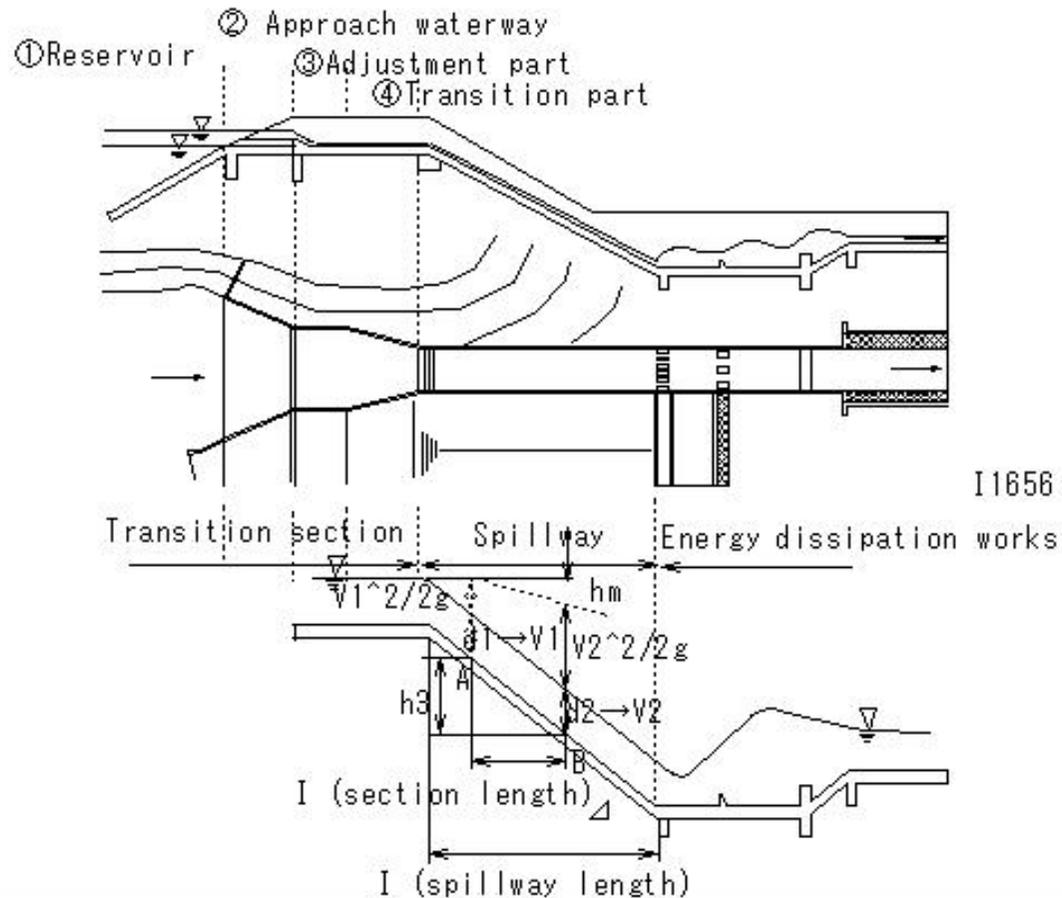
Plan shape of the transition section (contraction shape)
